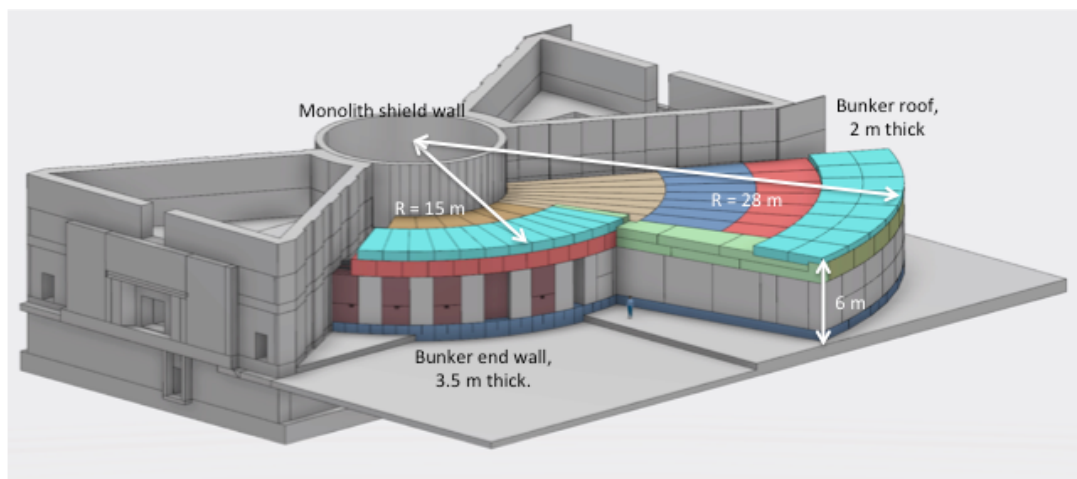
The image shows an overview of one side of the bunker. The scope of the bunker project includes the bunker end wall, the bunker roof from the monolith shield wall up to the bunker end wall and the support structures for the bunker roof.
